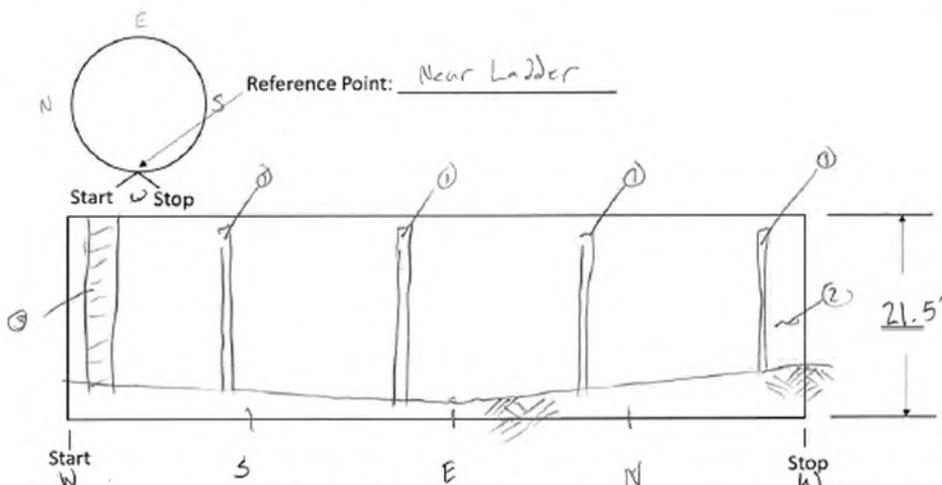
Reservoir EXTERIOR WALL Elevation– Note location of ladders and other features.
